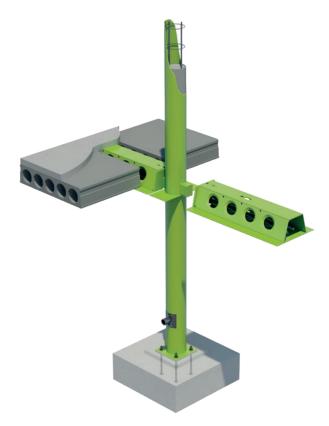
TYPICAL SECTION OF A DELTABEAM® FRAME
